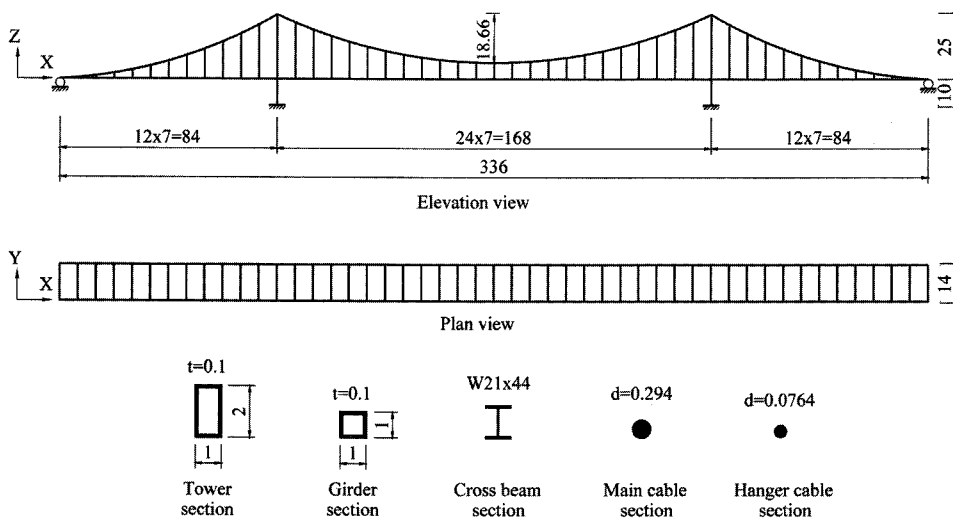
Geometry and dimension of suspension bridge(unit : m)
